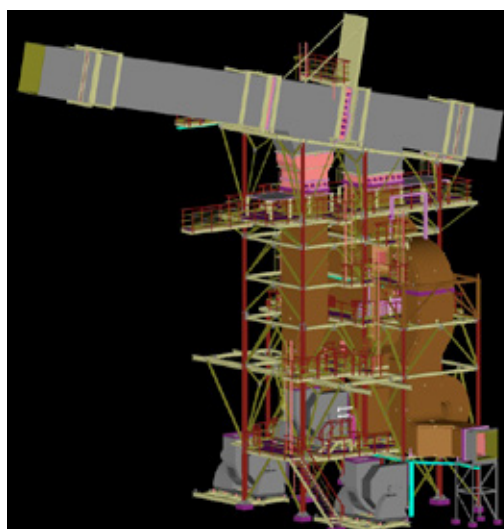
3D design of APH (Air Pre-Heating) system, complete of all structures, ducts, equipment, instrumentation and piping
